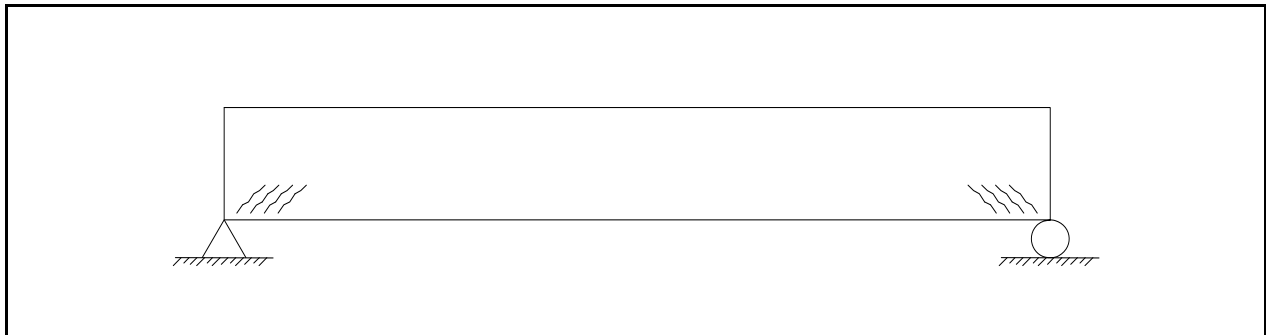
Typical Shear Crack Locations and Orientation.
